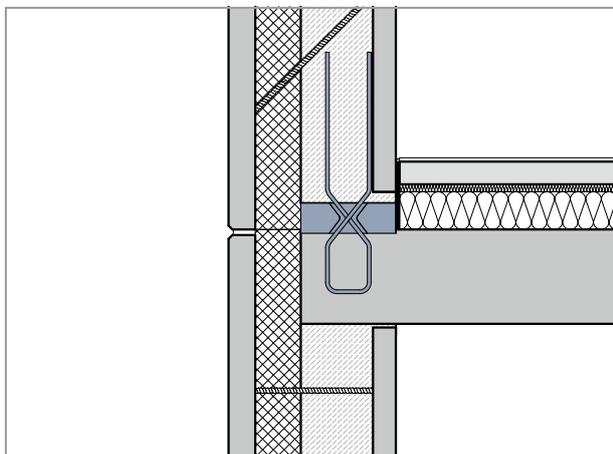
Schematic diagram Schöck Sconnex® type W with sandwich walls and above-slab insulation
